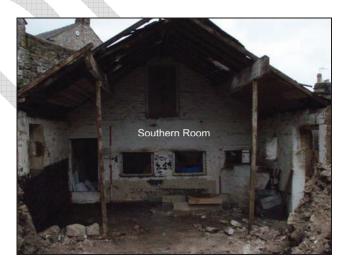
Interior of southern room after demolition of south-west wall and entranceway (facing north-east) (scale = 2m).
